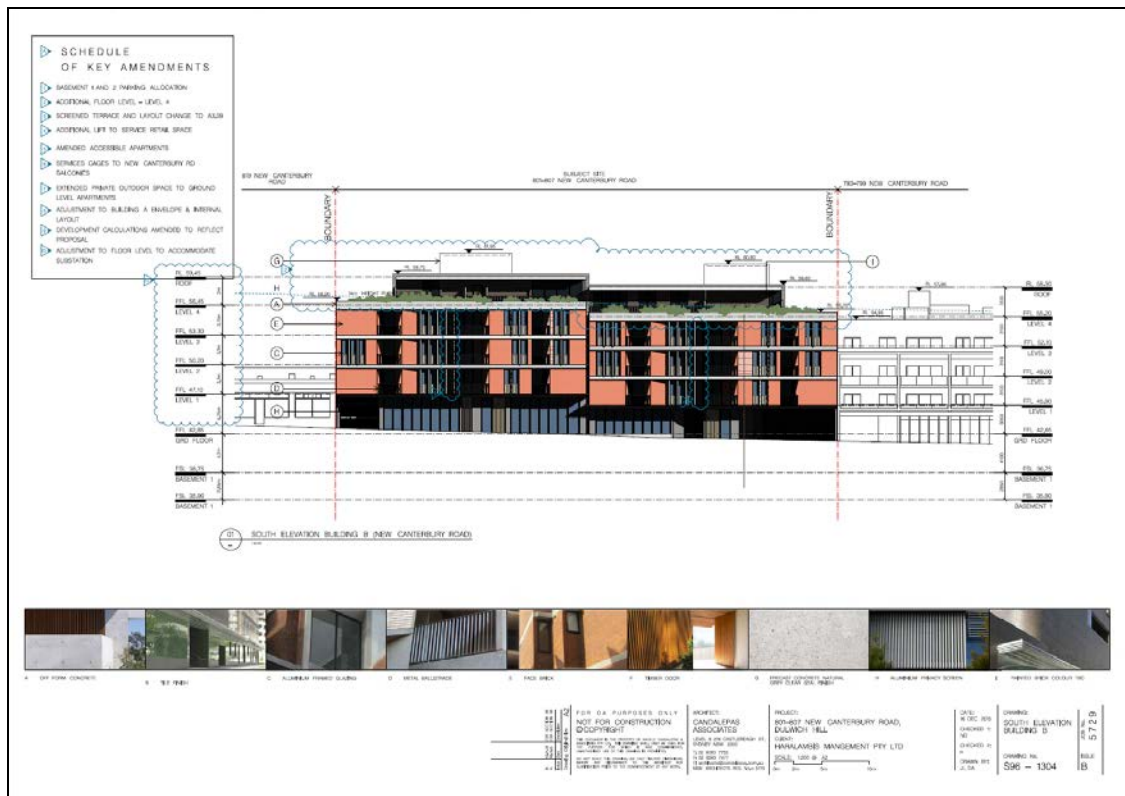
South Elevation (Building B), New Canterbury Road Frontage
